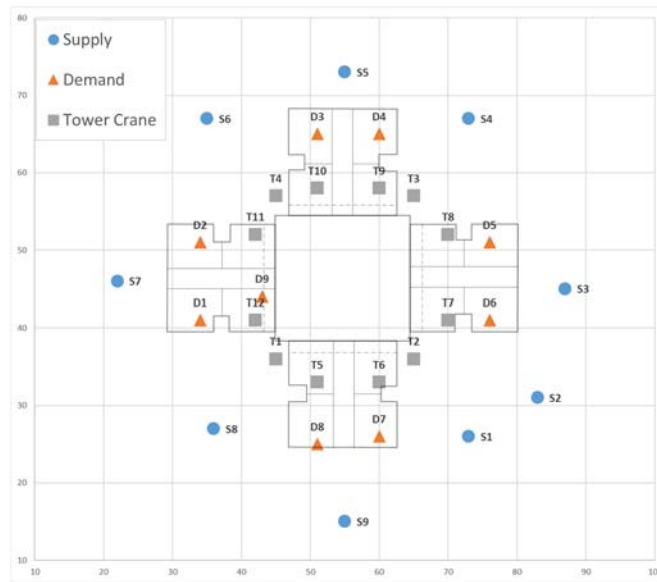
Project Site Plan With Facility Locations (Tam et al., 2001)
